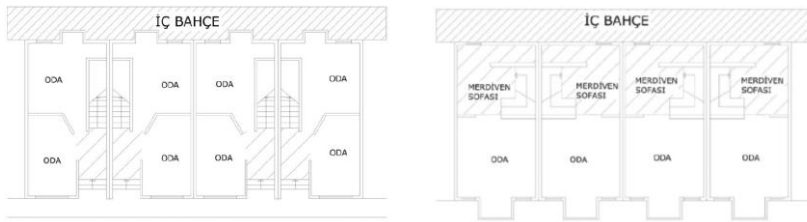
Fener Yıldırım Street row house ground floor and standard floor plan (Yılmaz, 2018)
